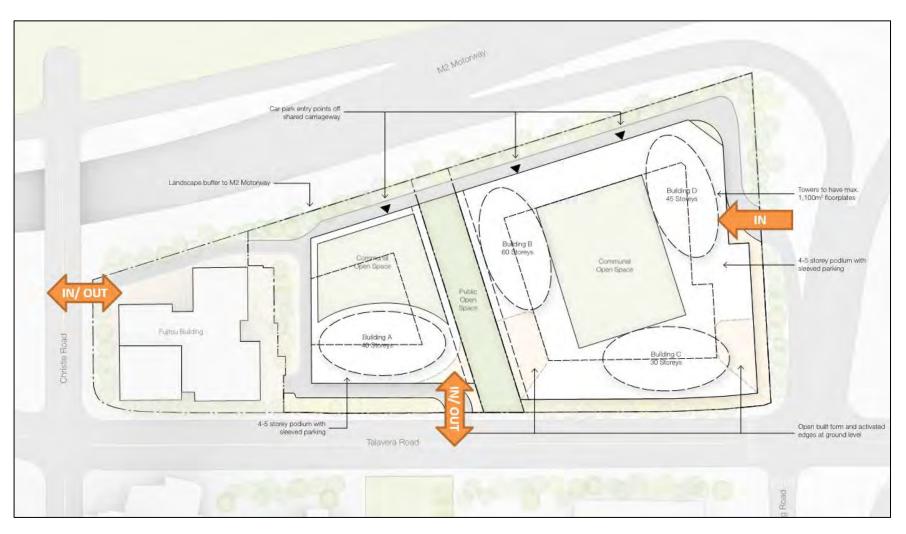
Site concept plan (Source: SJB Architects, May 2017)
